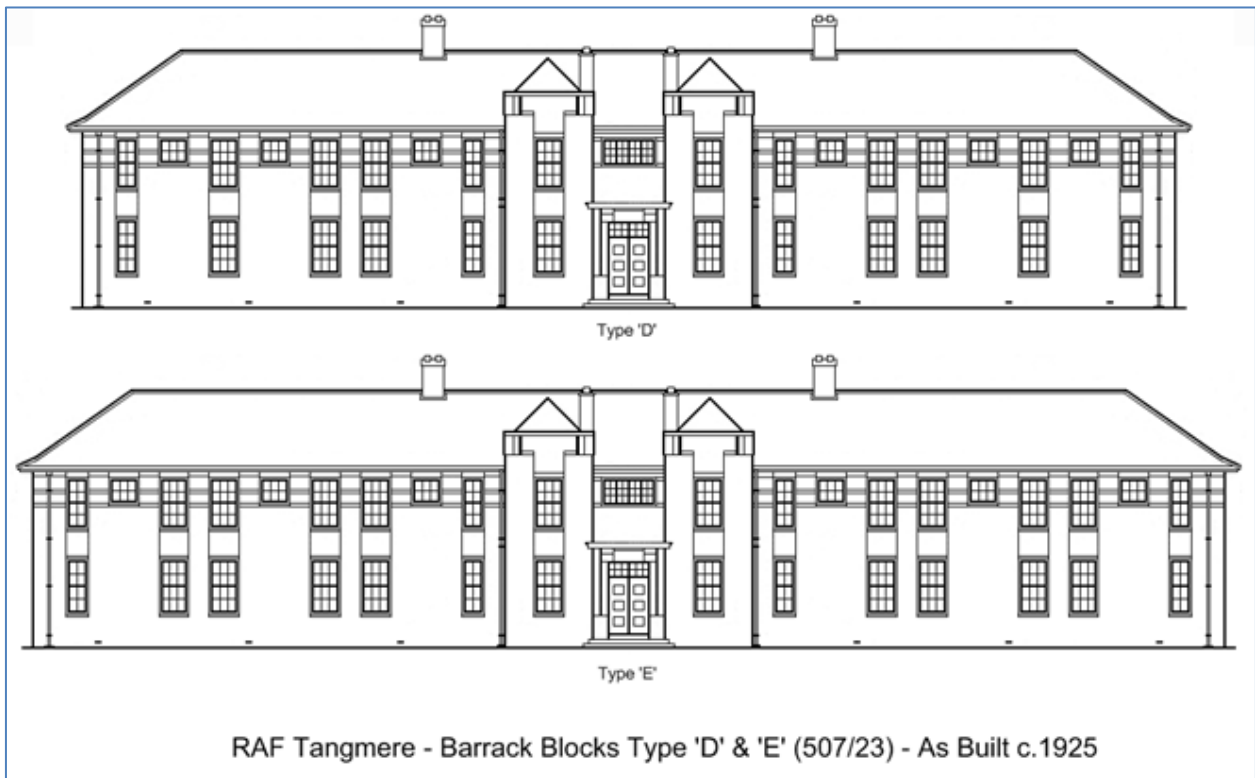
Front Elevations of Type 'D' & Type 'E' Barrack Blocks
